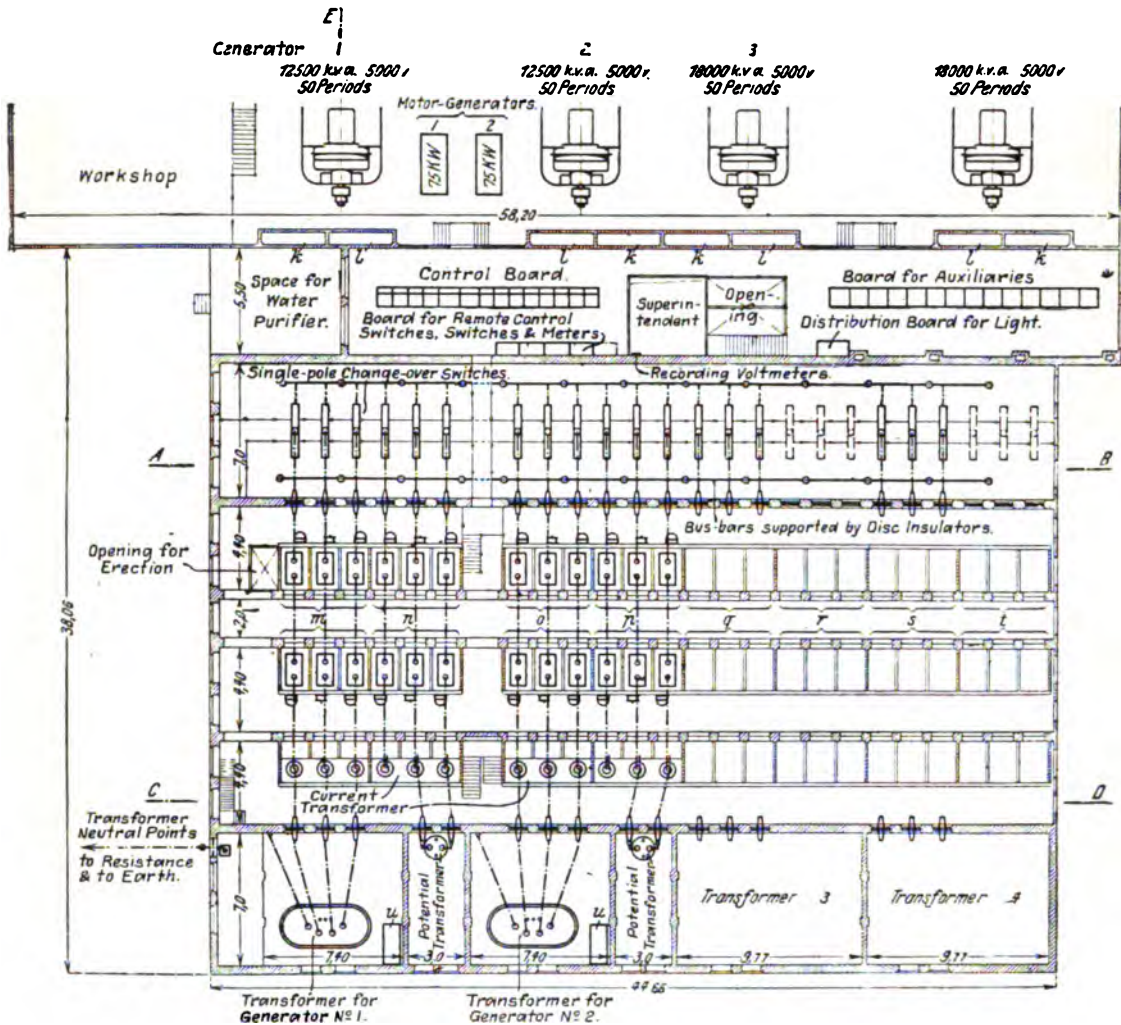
Vereeniging Power Station. Plan and Section of Switch House. Scale, 1 to 400. (Dimensions in metres.)
